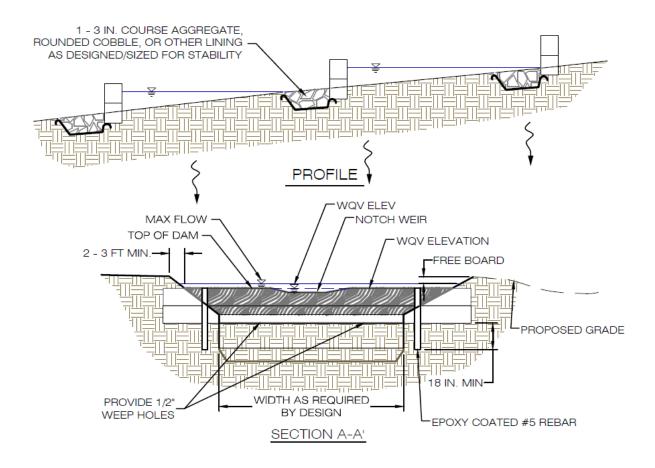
A.3 Grass Channel with Check Dams - Typical Plan, Profile, and Section
